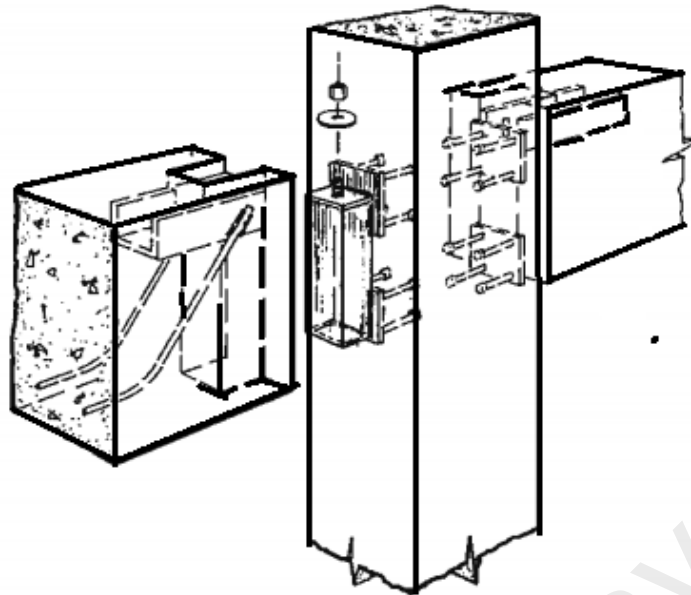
Unsuccessful type of precast beam to column connection (Elliott,1996)
